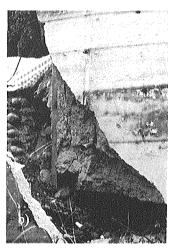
Damage to gravity type retaining wall due to excessive inertia force and/or loss of bearing capacity (along District Road No.129; site 4 in Fig.1)
